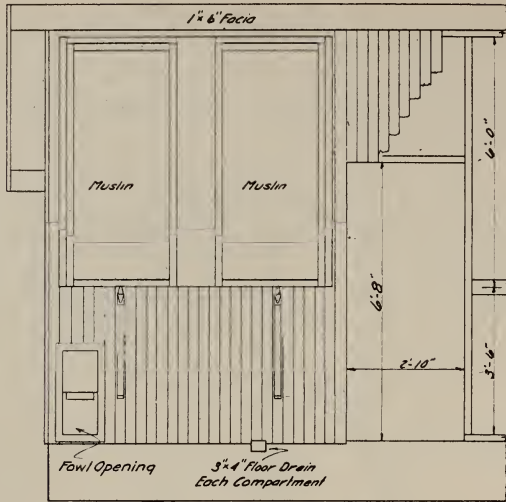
Showing front wall construction of breeding house. See figure 50 for curtain dimensions. Figure 11 illustrates the construction of the outside doors.
